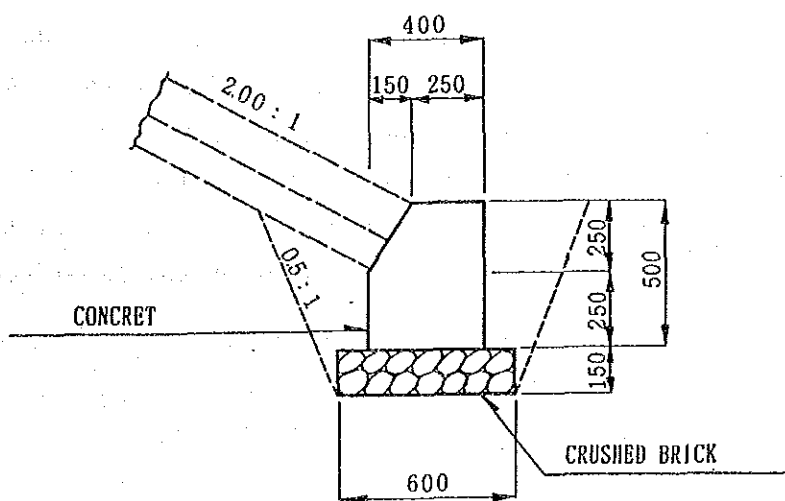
Slope Protection for Part of Main Drainage Canal
